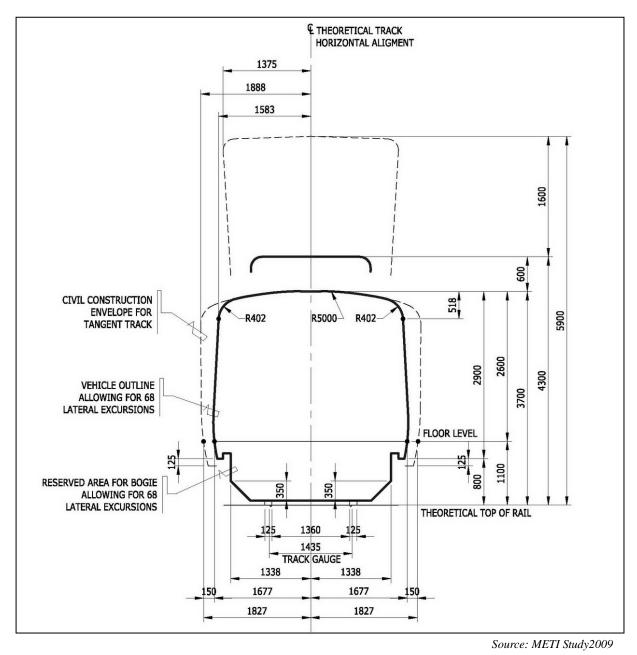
Civil Construction and Rolling Stock Envelopes
